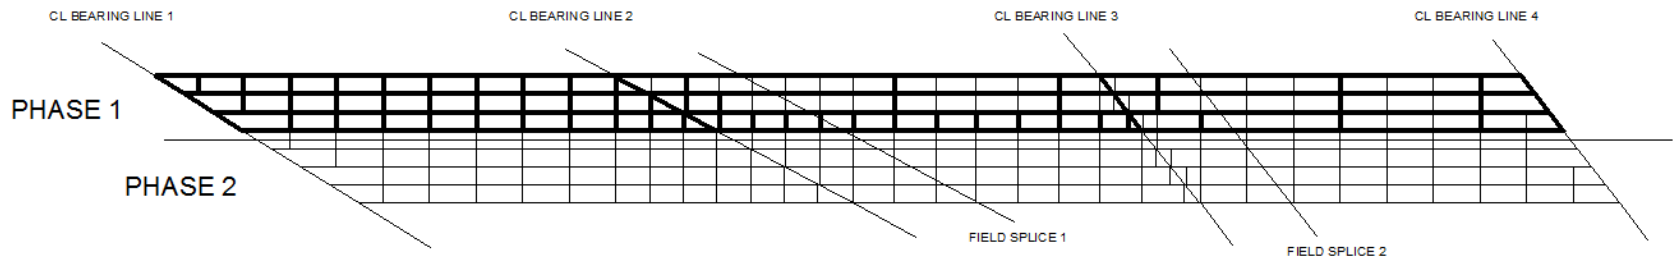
Critical erection stage of Bridge (M1) EICSS2 for TDLF detailing. The darker lines show portions of the bridge that are already completed.
